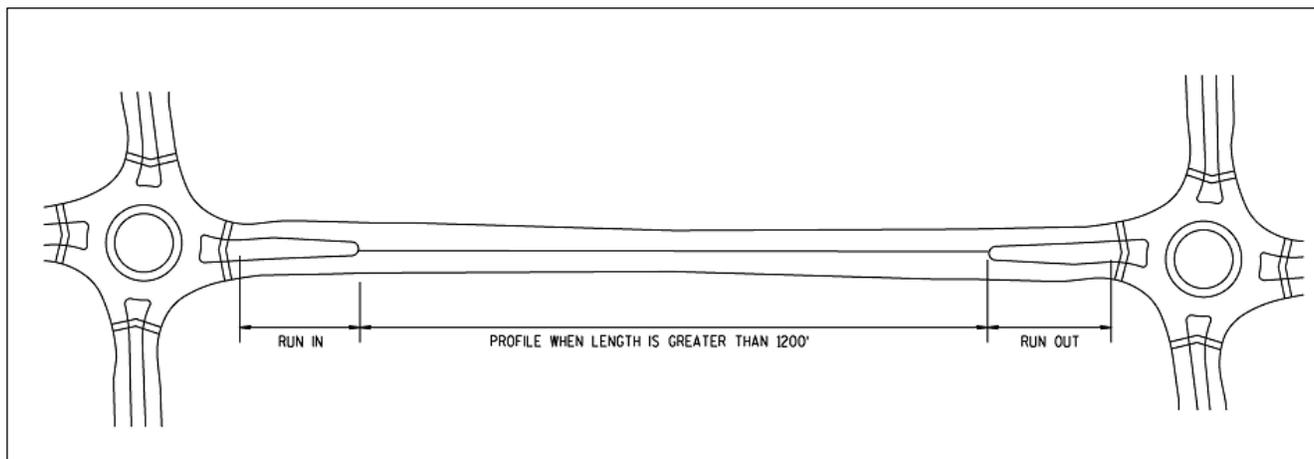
Profiling Pavements To and From a Roundabout
